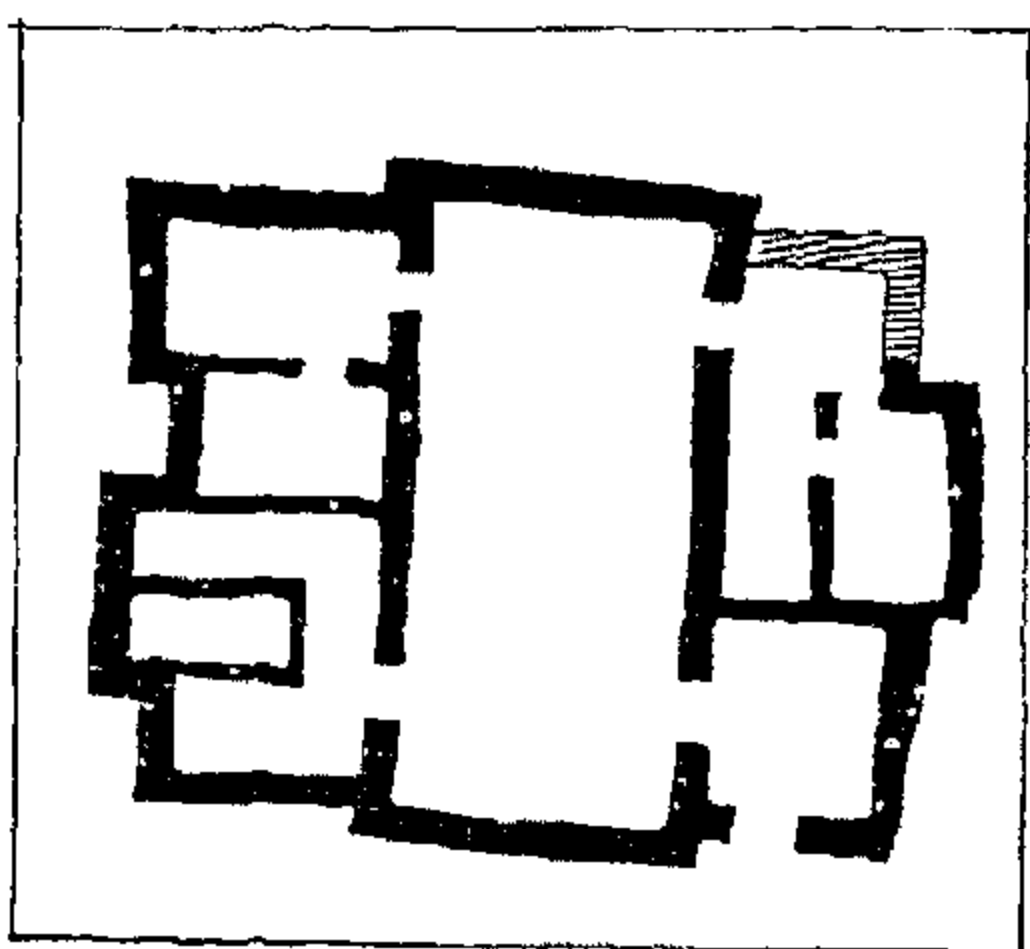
Plan of House at Tell 2, Telul el - Thalathat (after Egami 1959, Fig. 47 on pp. 140 - 141).
